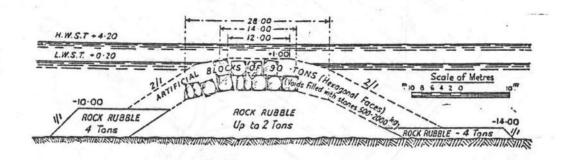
Cross Section of Outer Submerged Breakwater at Leixoes
